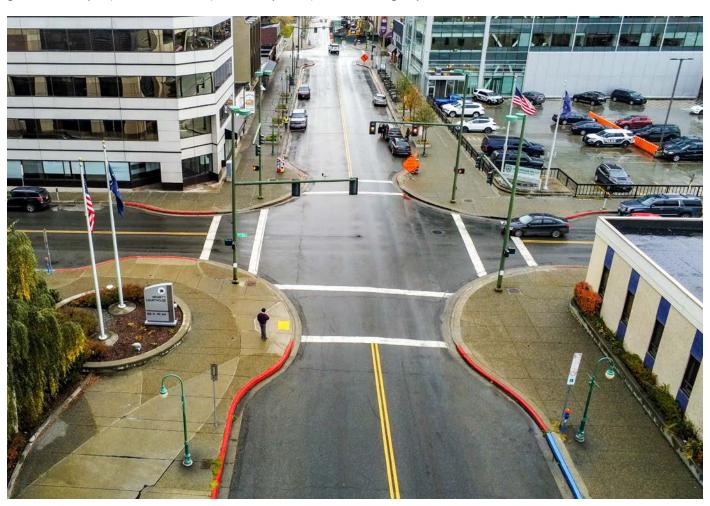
Curb Bulb-outs in Downtown Anchorage, Alaska
